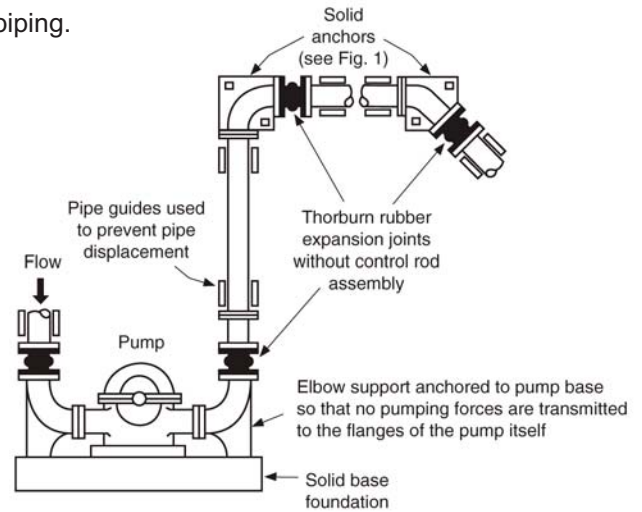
Typical piping layout utilizing Thorburn rubber expansion joints when equipment and piping are properly anchored
